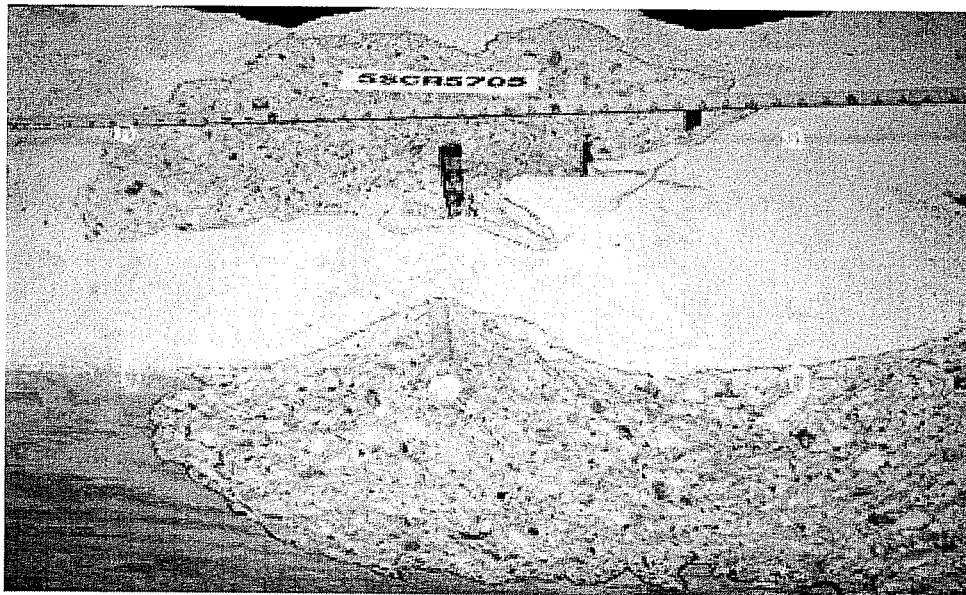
Cone Failure of Front Anchor and Pryout Failure of Back Anchor for Double-Anchor Connection with No Hairpin Loaded in Shear
